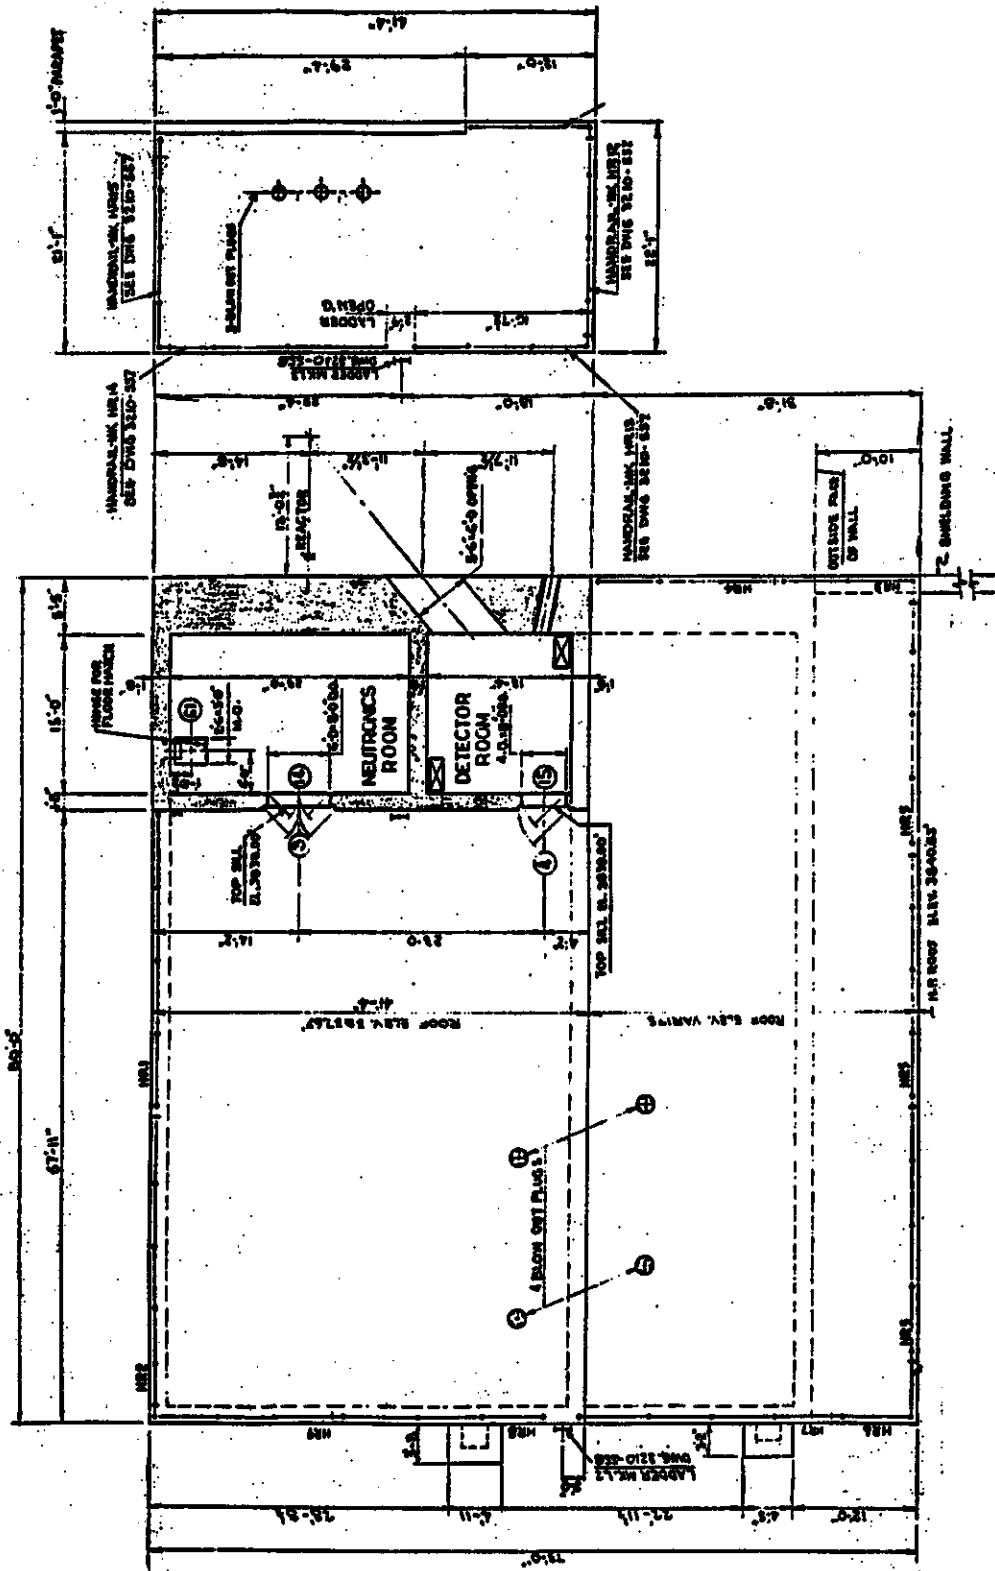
Test Cell C, Building 3210, Penthouse and roof plan, ca. 1960.
